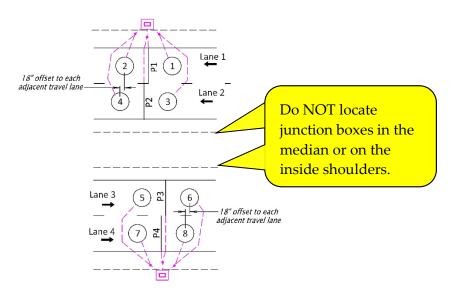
| Typical Junction Box, Wire Entrance, and Pavement Cuts
